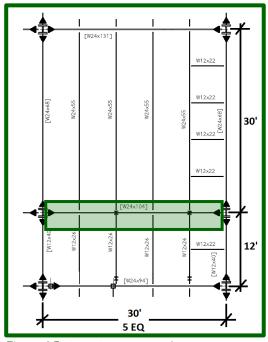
Floor plan courtesy of Project Engineer. The bay chosen to spot check. The girder checked is highlighted in green.
